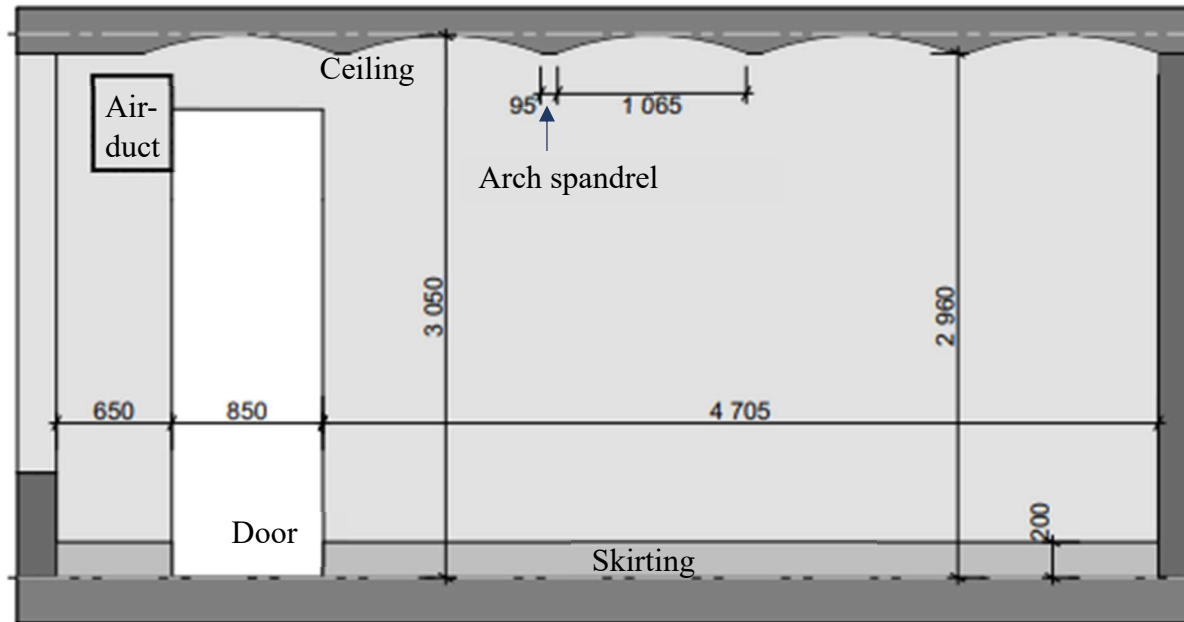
East wall elevation, Archicad. Scale 1:50. Elevation by Keaghan De La Mer.
